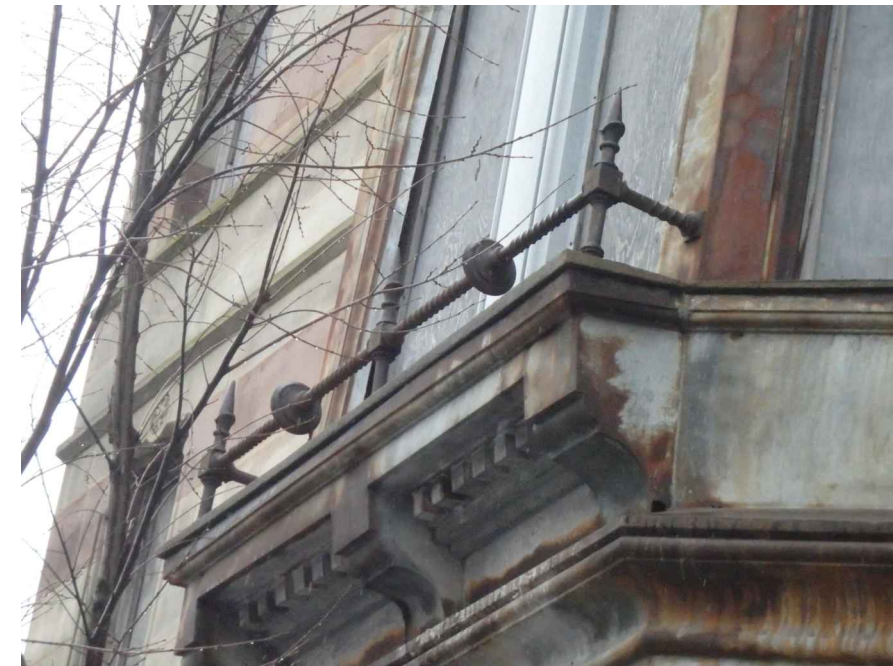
EAST ELEVATION, REPLICATE EXISTING HISTORIC CAST IRON RAIL ON BALCONY ON BAY WHERE MISSING
